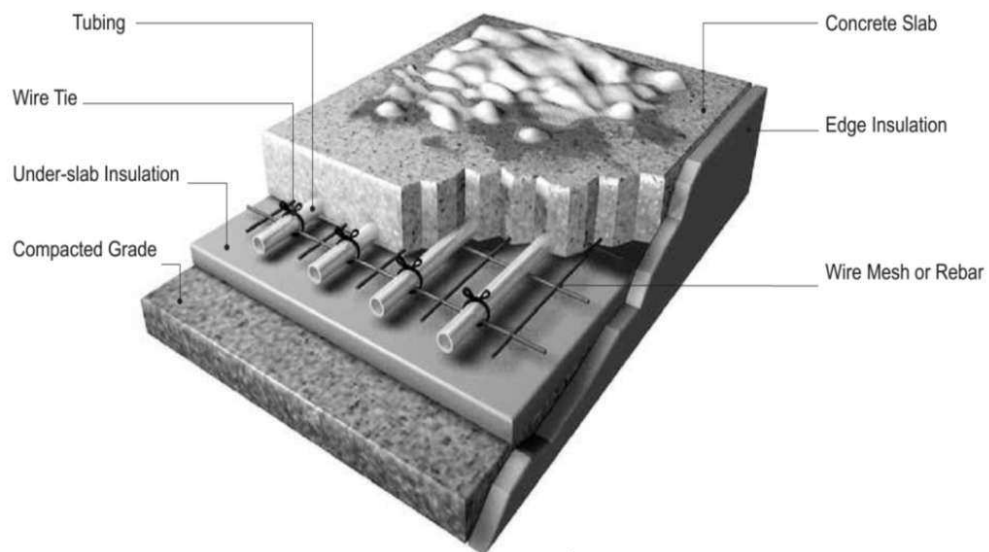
Pipes installed within reinforced concrete slab [22]
